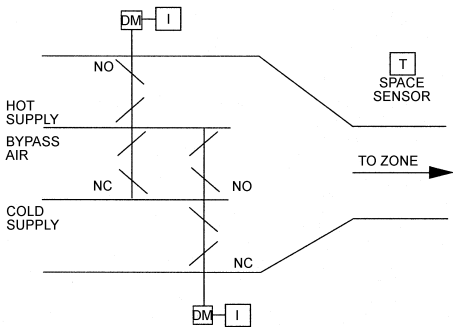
Zone Mixing Dampers—Three-Deck Multizone System
